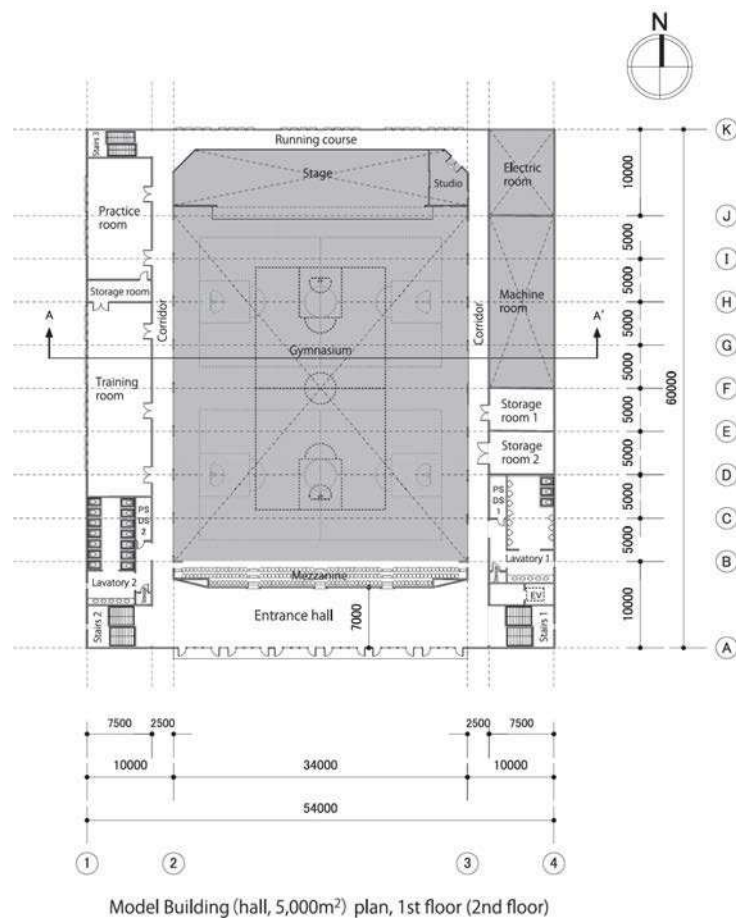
Model building (hall, 5 000 m²) plan, first floor (second floor)
